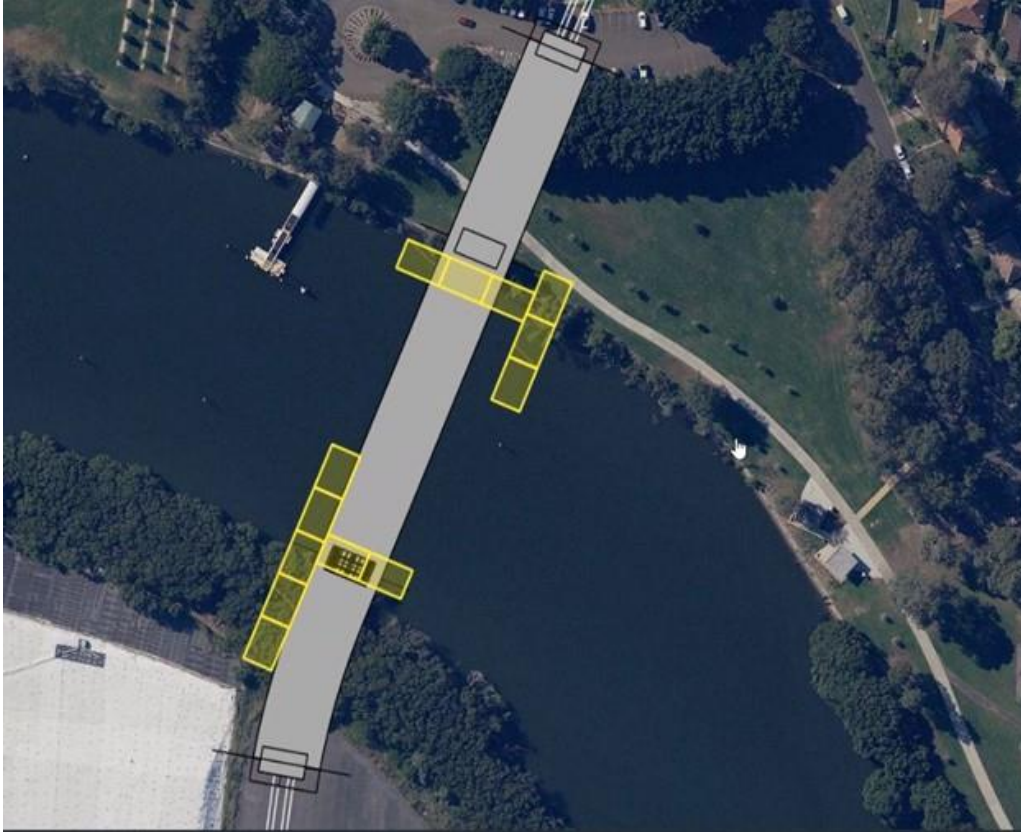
Conceptual arrangement of temporary working platforms between Camellia and Rydalmere
